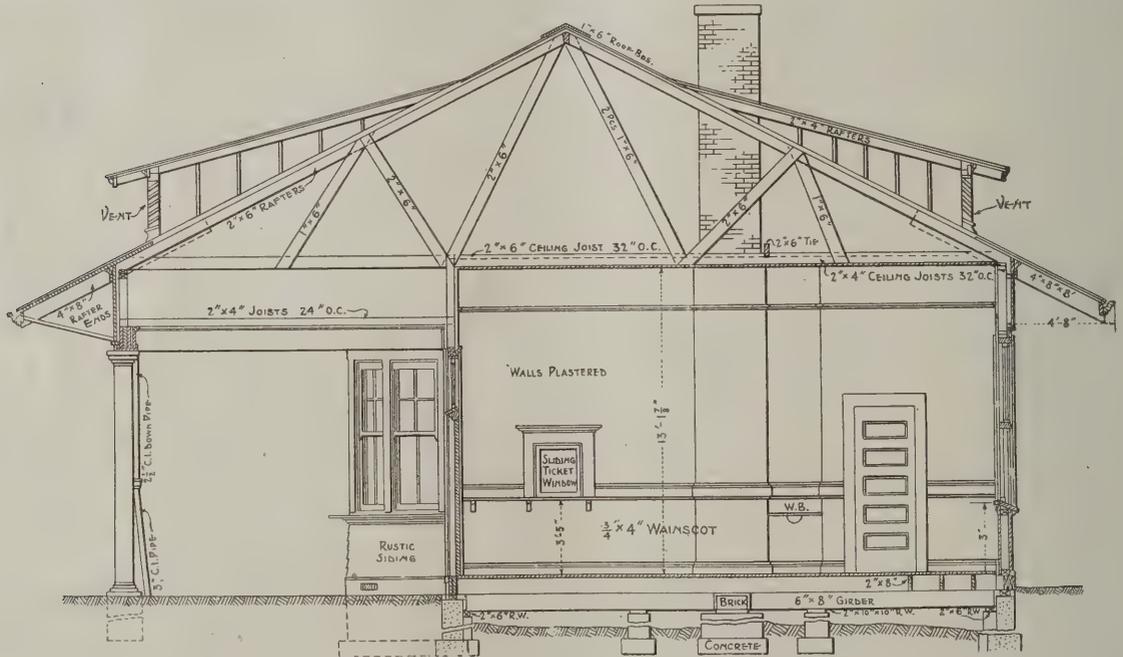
Transverse Section of Building on Line A—B of the Plan—Scale 1/8 in. to the foot
